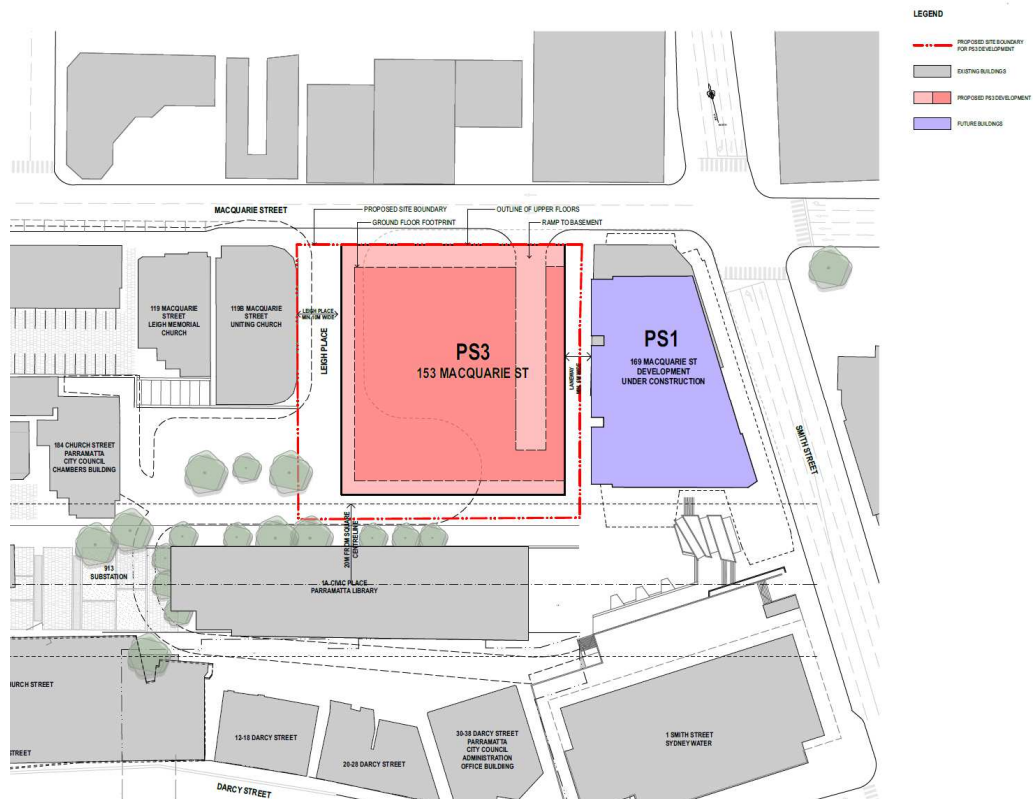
Site Plan (Source: FJMT, Drawing No. DA1002, 16.09.15)
